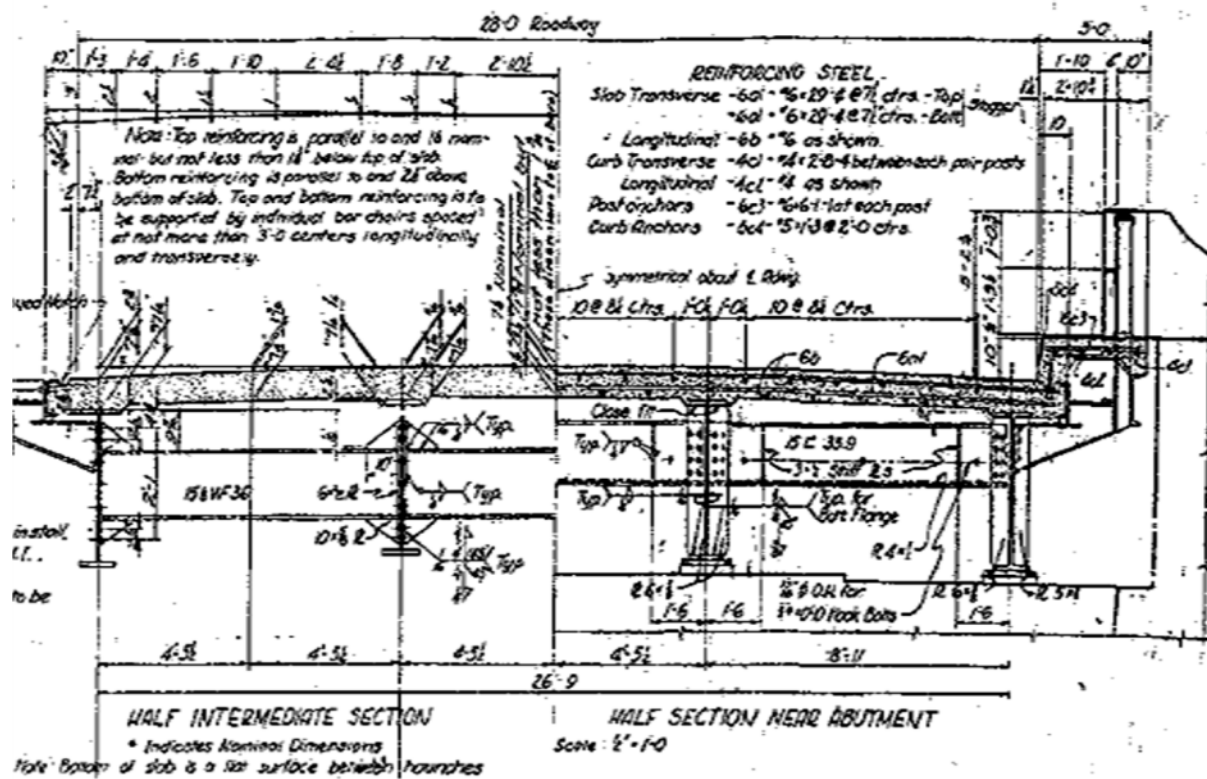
Deck R2 half-sections near abutment and at intermediate section.
